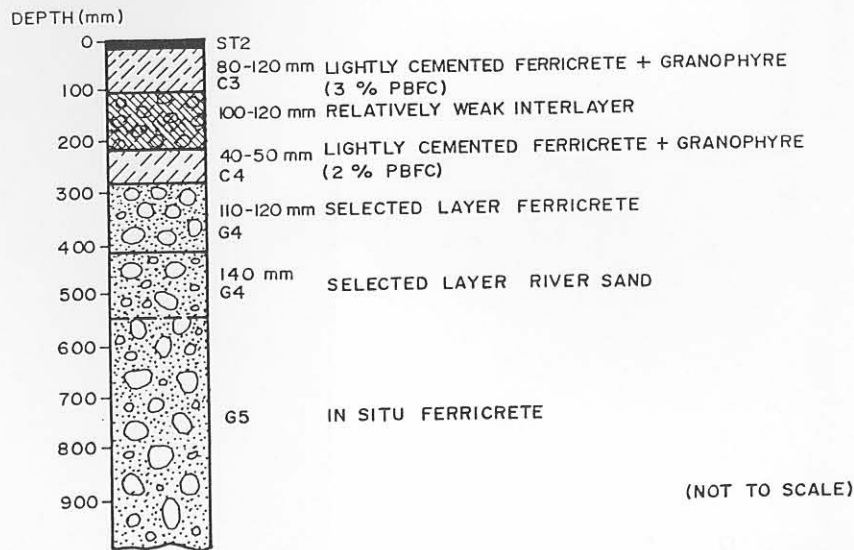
(b) DETAIL OF THE RELATIVELY SHALLOW PAVEMENT STRUCTURE AT THE HVS SITE AT km 12,6, ON ROAD 2212 NEAR BULTFONTEIN
